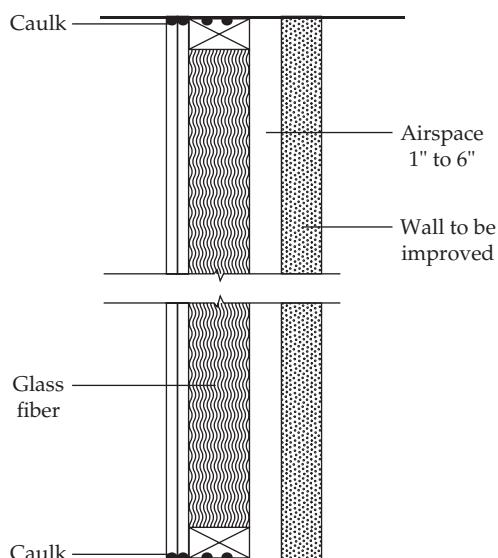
Improving isolation of an existing wall by adding an additional wall.
